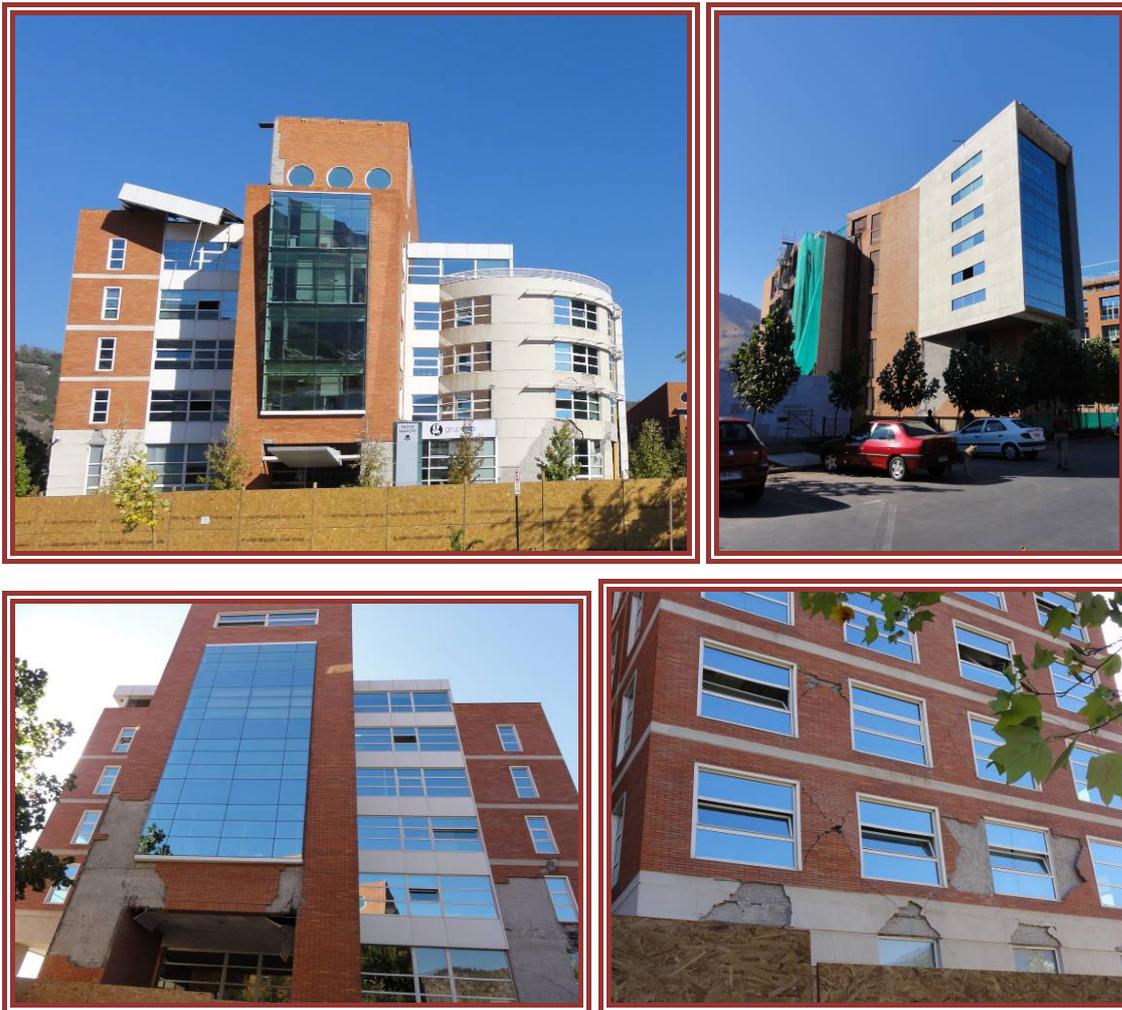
Damage to the structural system and facade of some modern buildings in Ciudad Empresarial, Santiago
